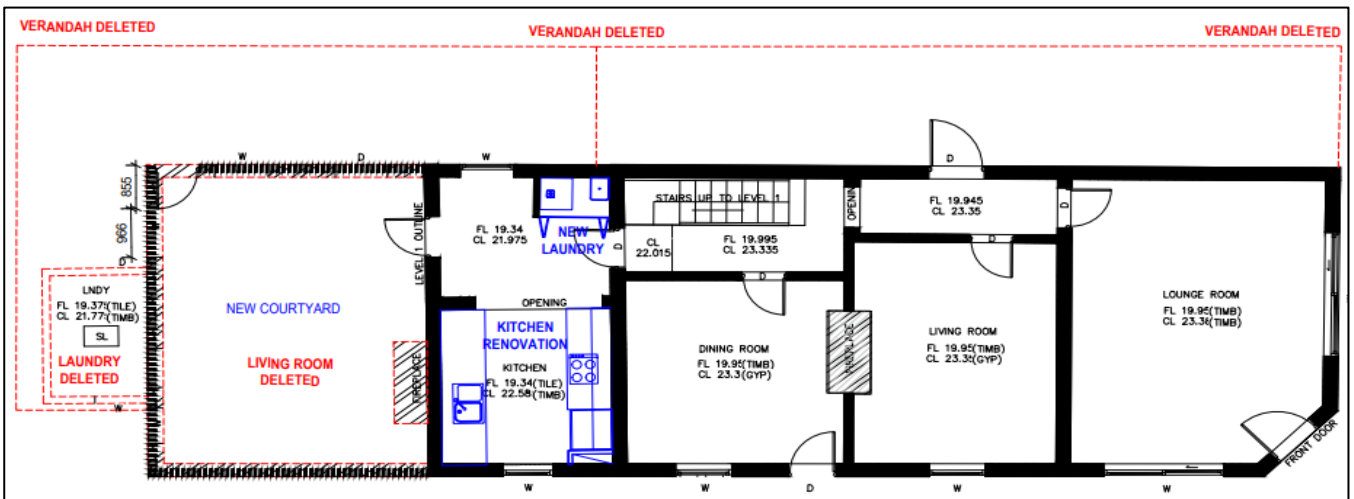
Extract of applicants submitted No.25 Stanley Street – Ground Floor Plan.
